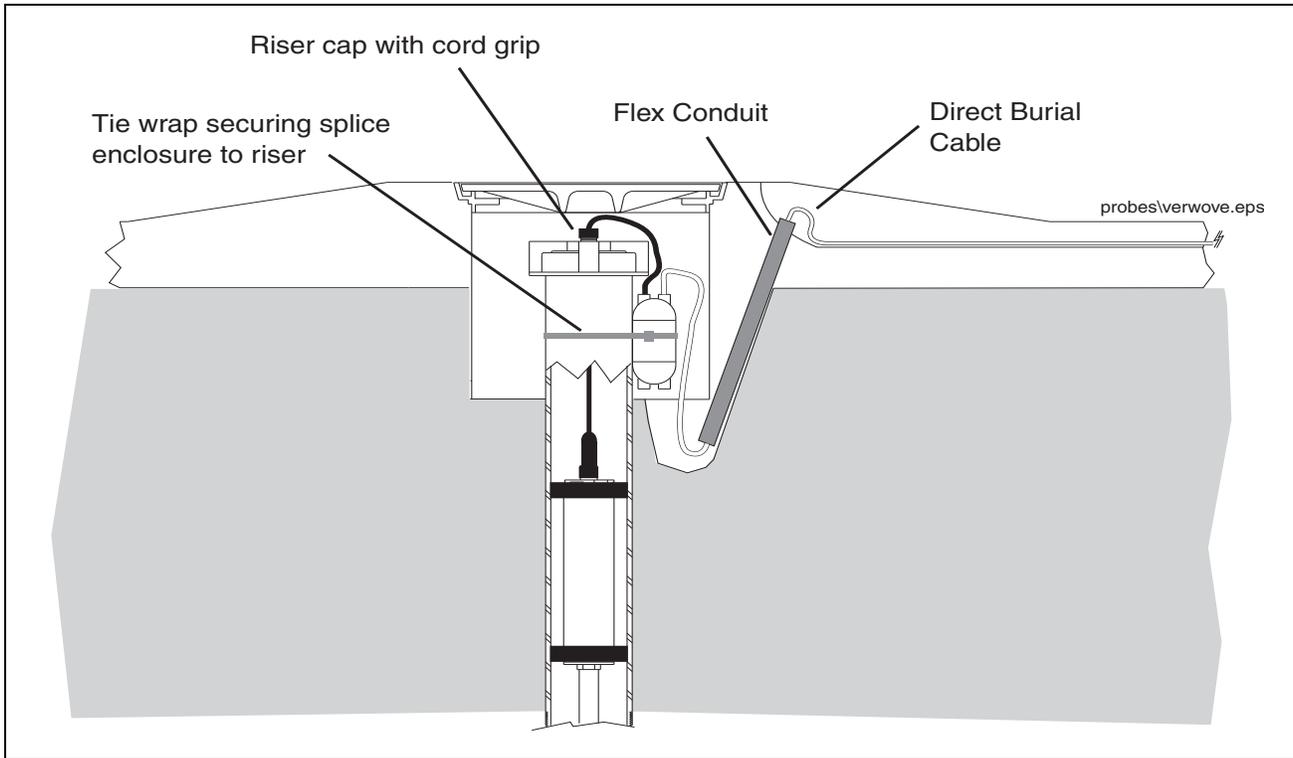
Mag probe vapor extractor riser installation - w/o coupling adaptor
